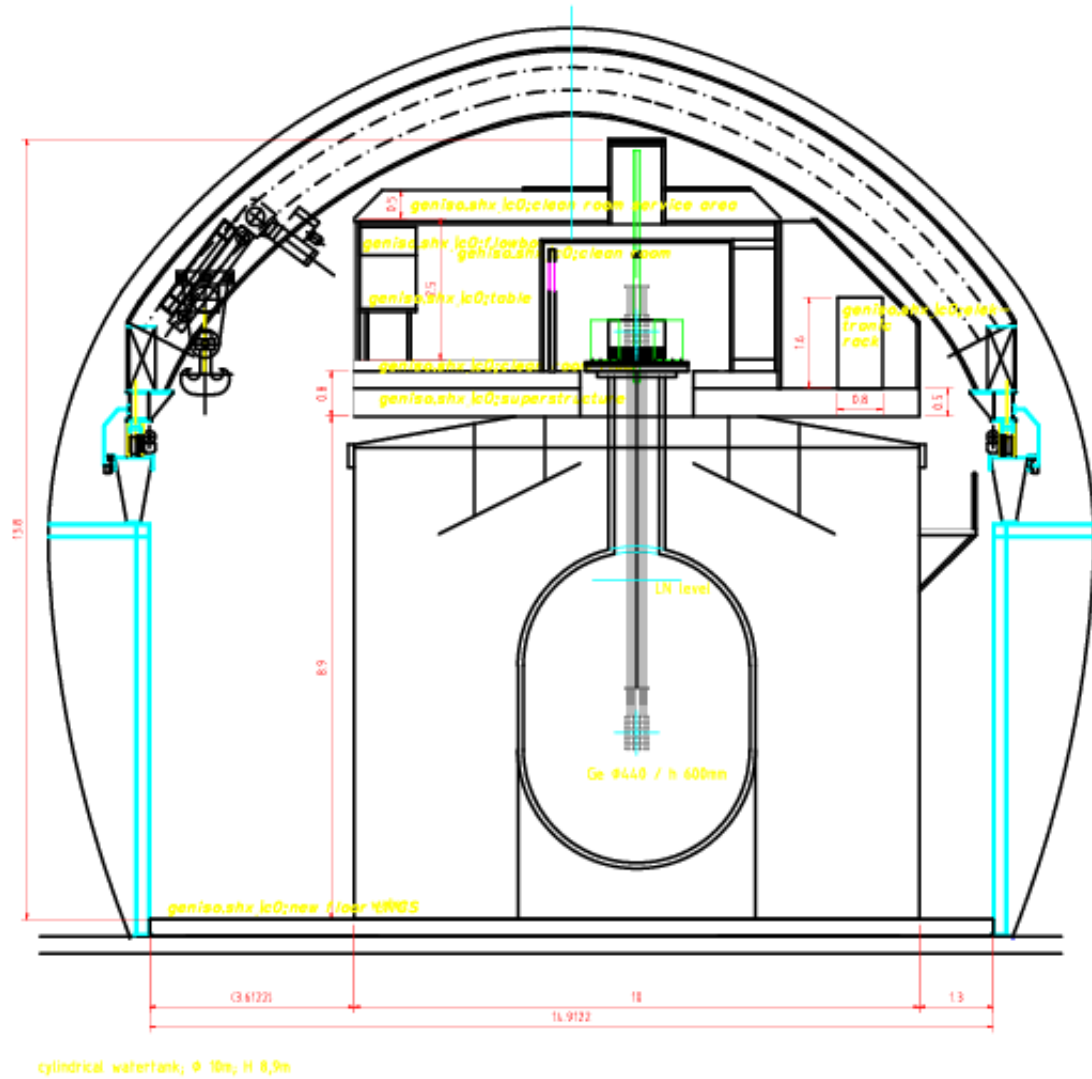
View of GERDA cross section from TIR tunnel. The shielding structure below the roof of the water tank might be not needed.
